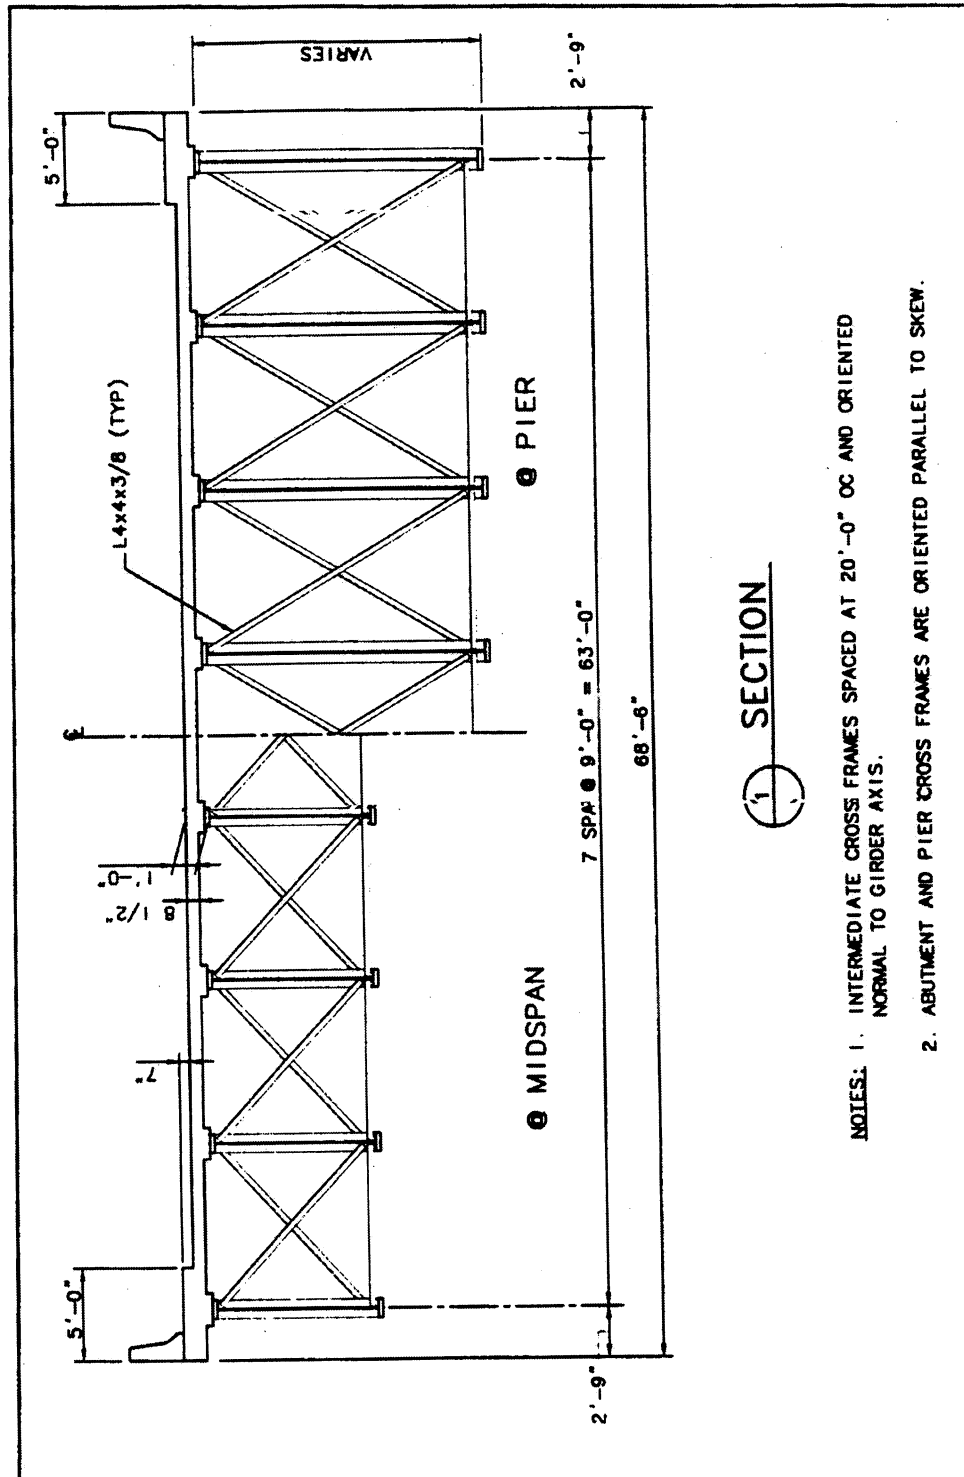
Bridge No. 2 – Typical Cross-section
